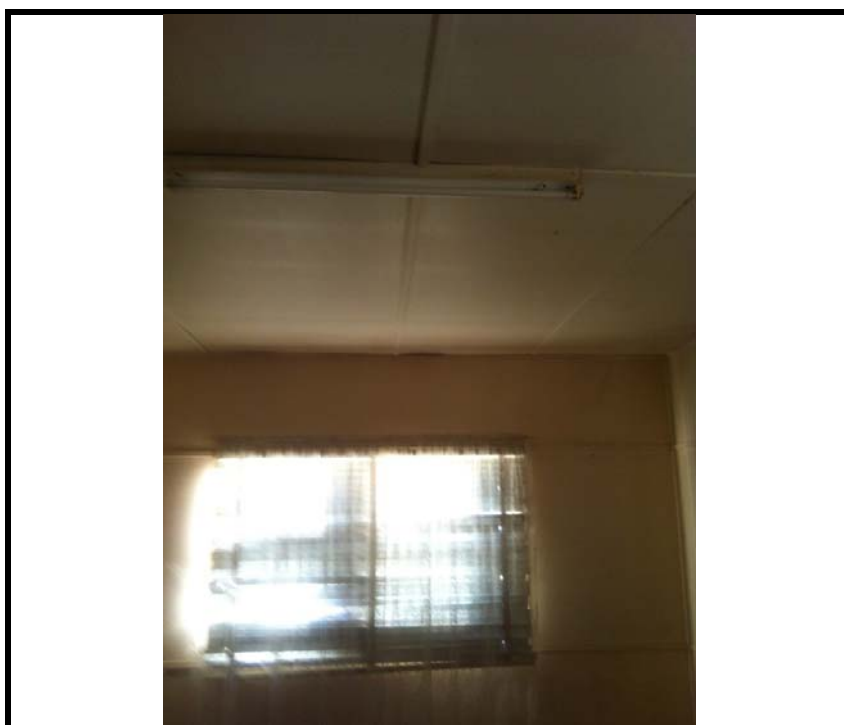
8 Bowditch Avenue - section of AC sheeting lining to wall and ceiling to bedroom adjacent to the front (western) room of the house
